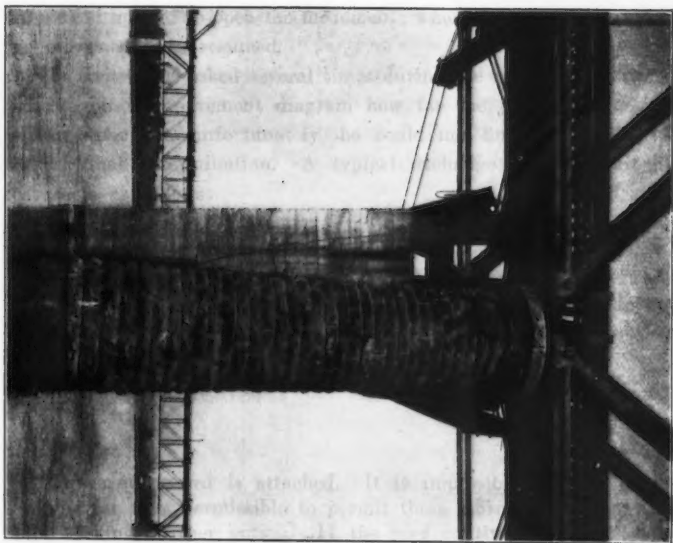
PIER 4, SHOWING STEEL BENT ENCASED IN CONCRETE.
